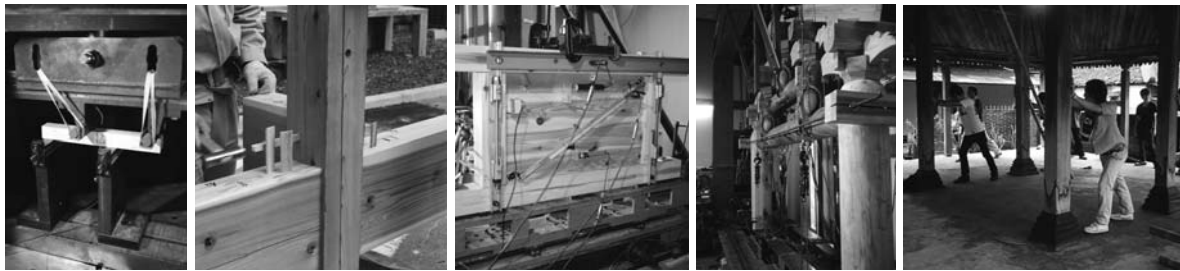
The photo of the experiment. From left to right: Material test of hardwood used as fasteners of the joint; Complicated Japanese traditional joint specimen; Small scaled in-plane shear test of plank shear wall with hardwood shear key; The racking strength test of Taiwanese traditional frame; In-situ measurement of dynamic vibration property of Indonesian traditional building.
